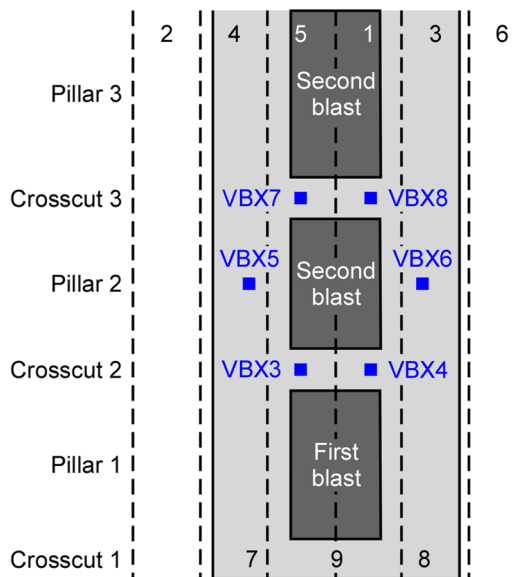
Plan view of vertical extensometers (VBX3–VBX8) installed in the CRF sill and back from the undercut entries
